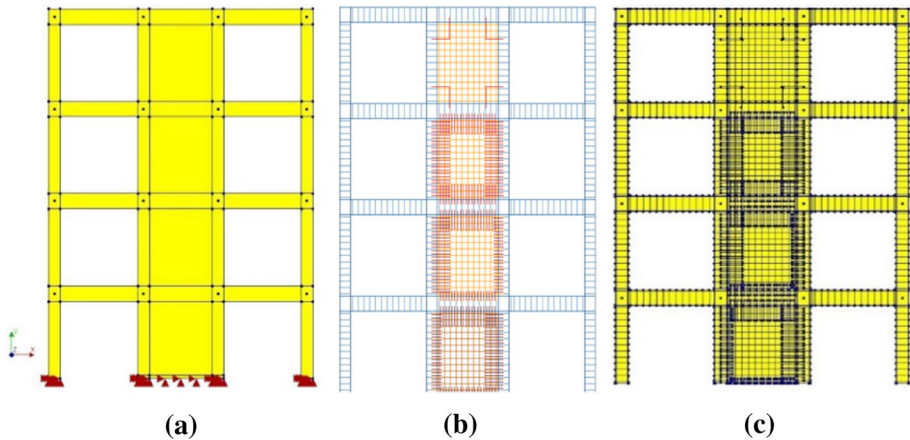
a Concrete geometry shapes of the FE model and boundary conditions, b Embedded reinforcement bars for the existing frame and web reinforcement of the infill wall and dowels, c Complete geometry of the FE model
